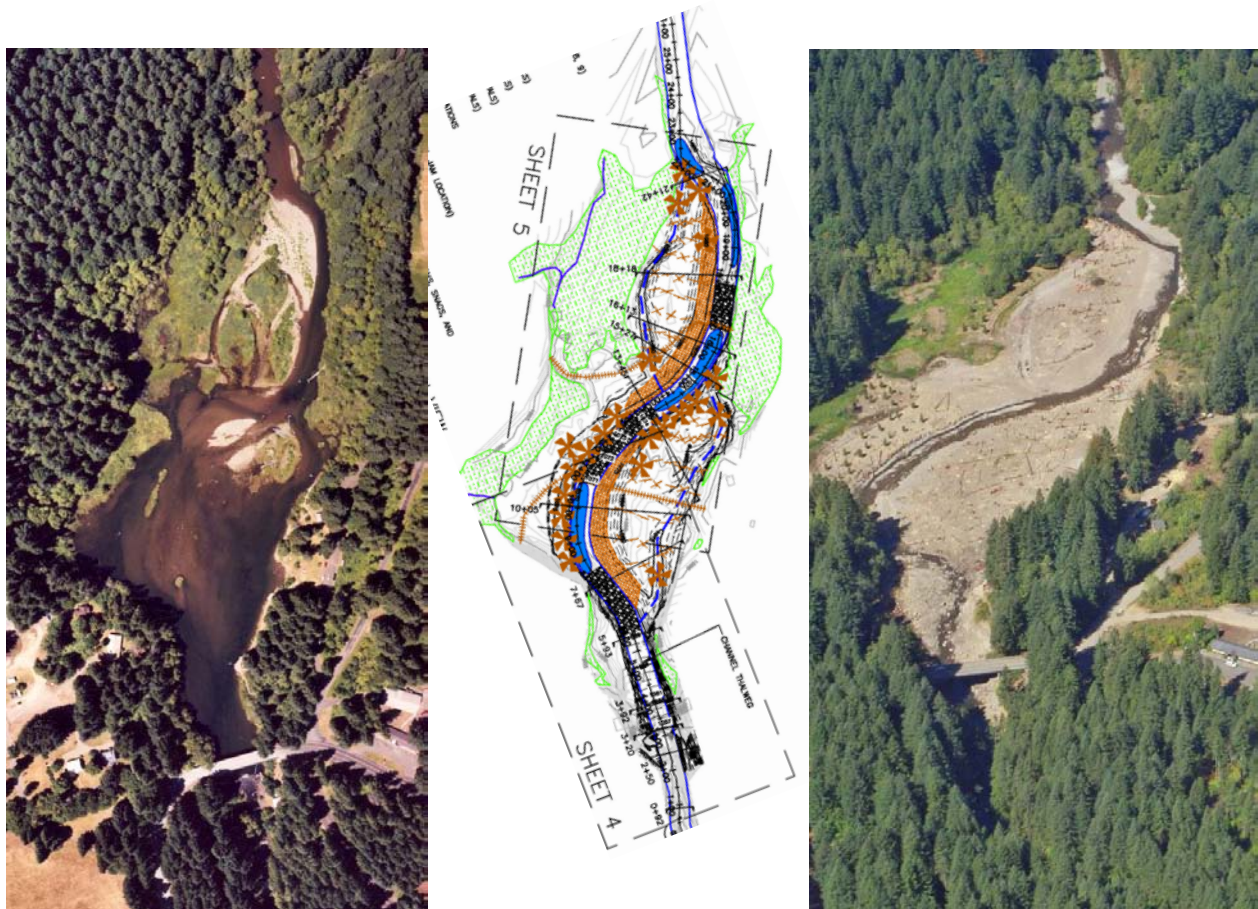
Reconstructed channel segments in the former reservoir of Hemlock Dam; Trout Creek, WA (Inter-Fluve, Inc.).
